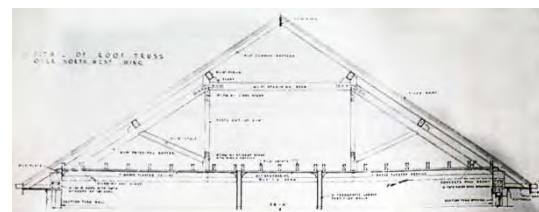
Parkes's truss detail for the nurses' accommodation building. This means that all internal walls are non loadbearing, but may play a role in stabilising the building. *Dubbo Health Service Archives
